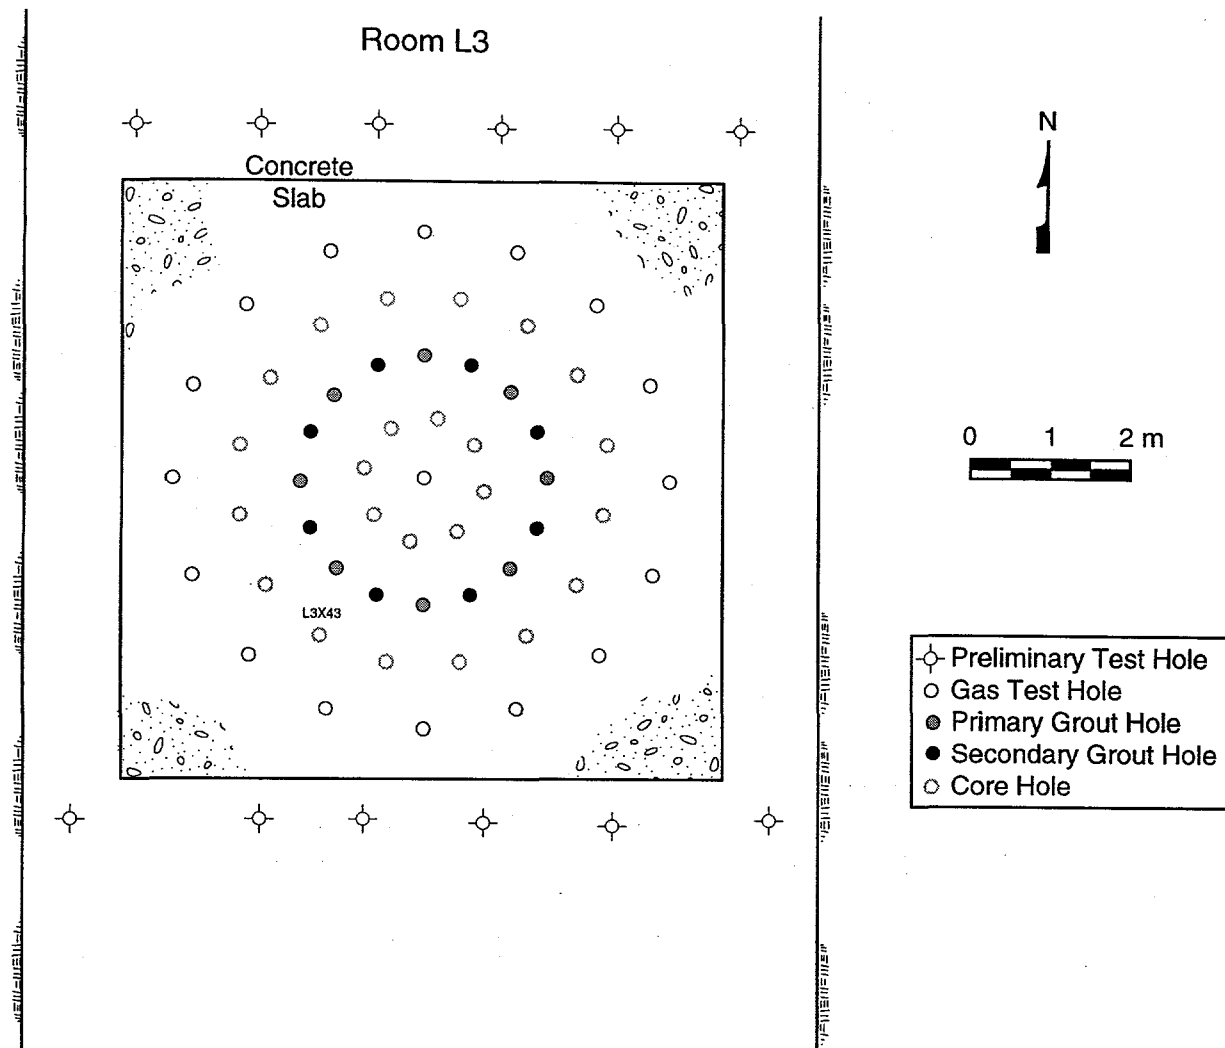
Plan view of Room L3 showing location of concrete slab and test holes.
